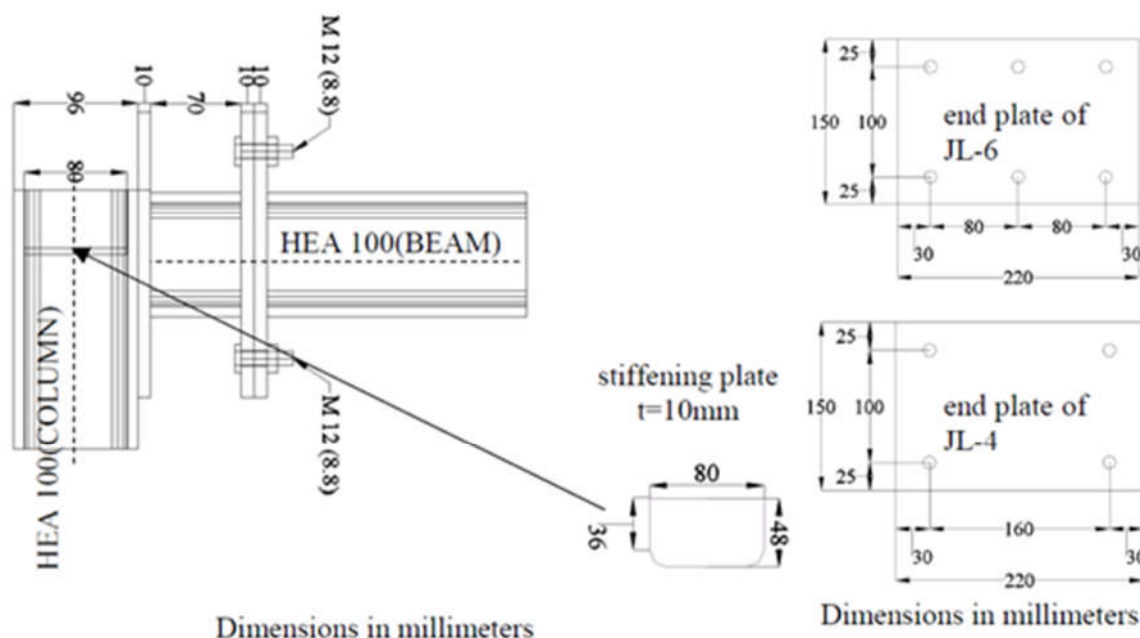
Two-dimensional schematic view of JL-4 bolted steel joint specimen configuration with geometrical details of the steel connecting plates of the JL-4 and JL-6 specimens.
